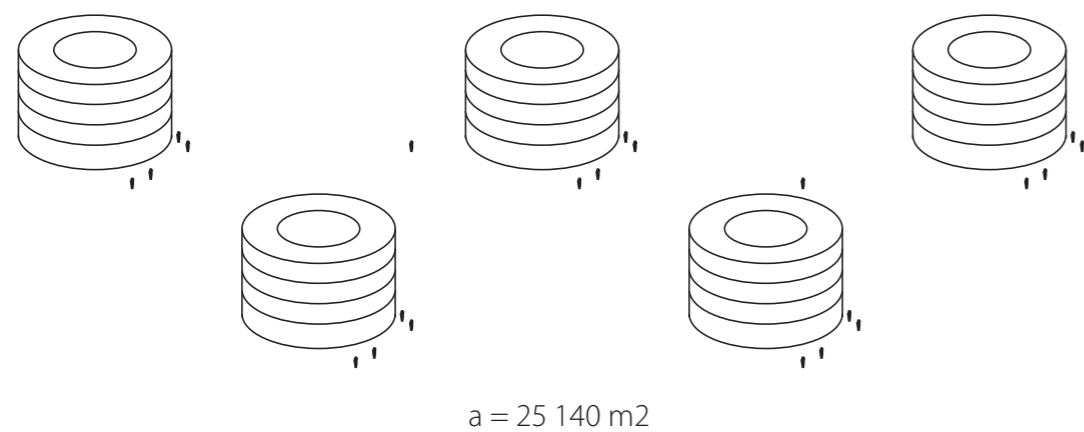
If the tanks also were redesigned to have four floor levels, the total floor area would be more than 25 000 m².
